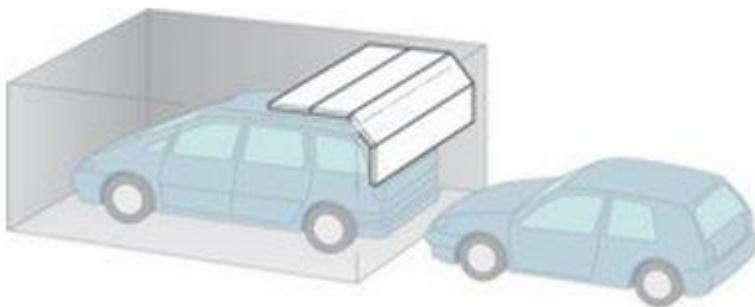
Image shows that space is saved in a sectional garage door [3].
